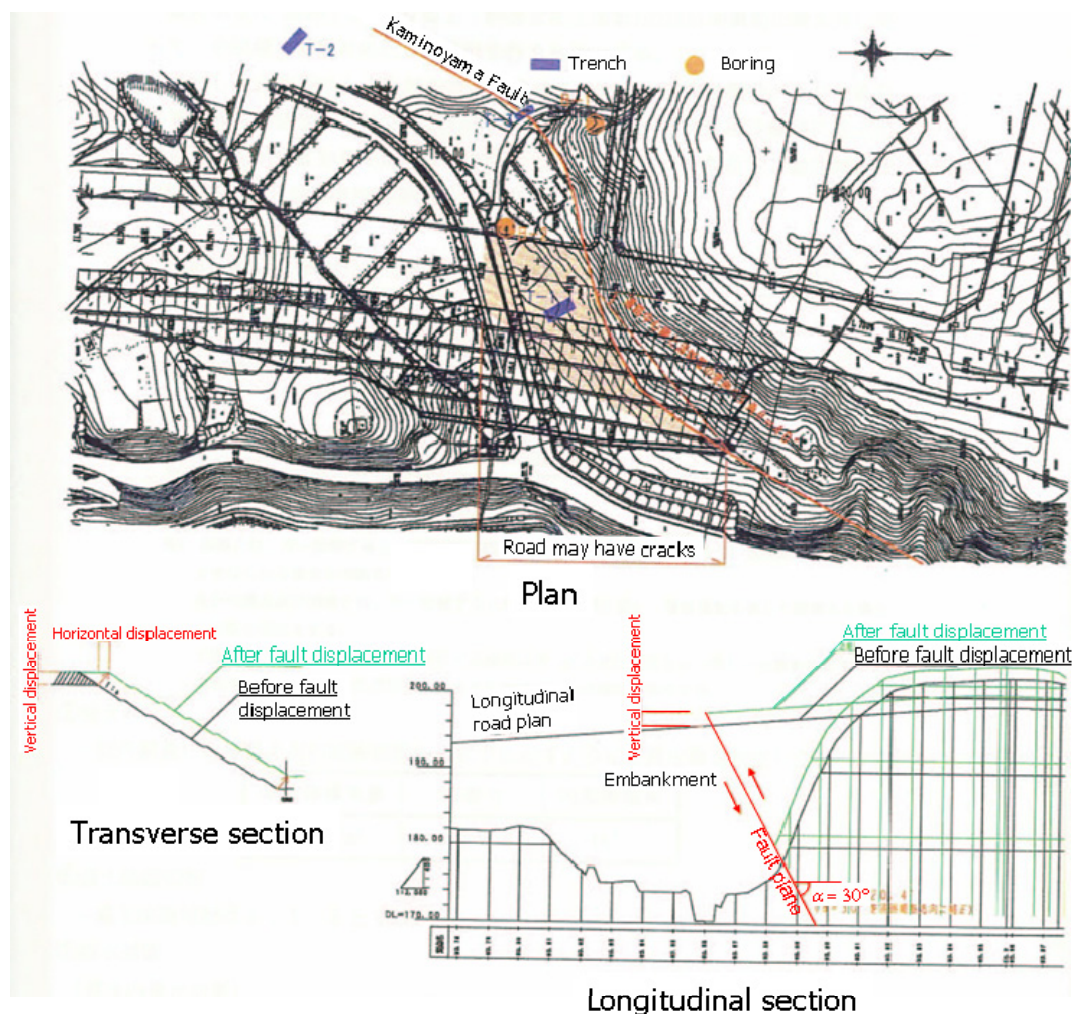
Plan and sections of the embankment and Kaminoyama Fault
